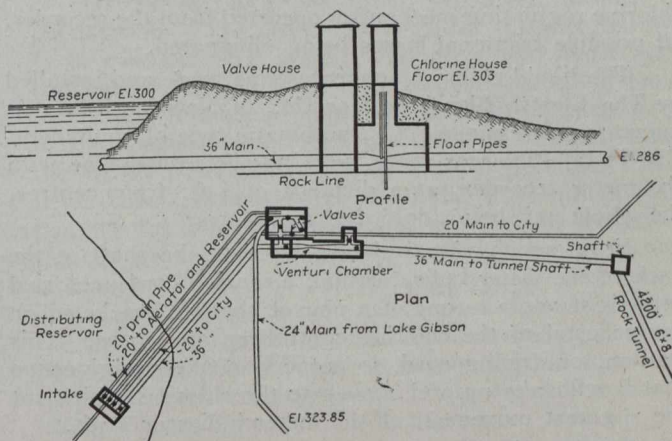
Layout of Buildings and Piping for the St. Catharines Liquid Chlorine Plant.
